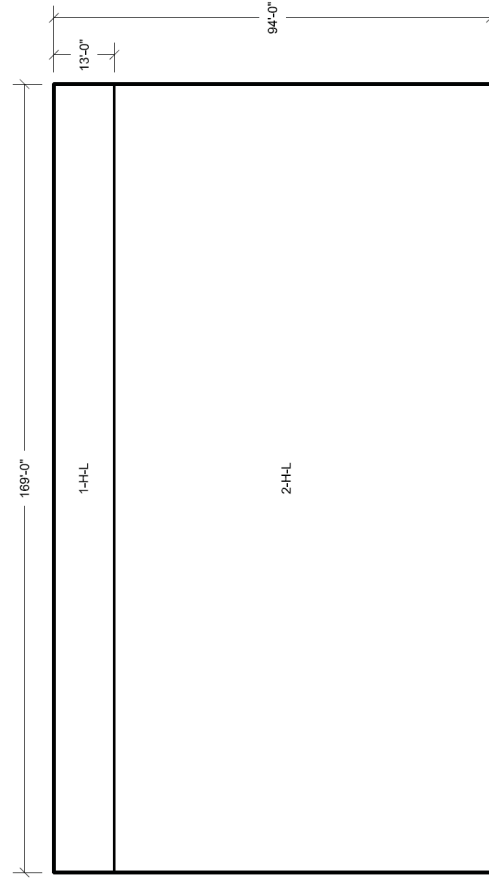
H.6-123: PUMP HOUSE FOUNDATION MAT
